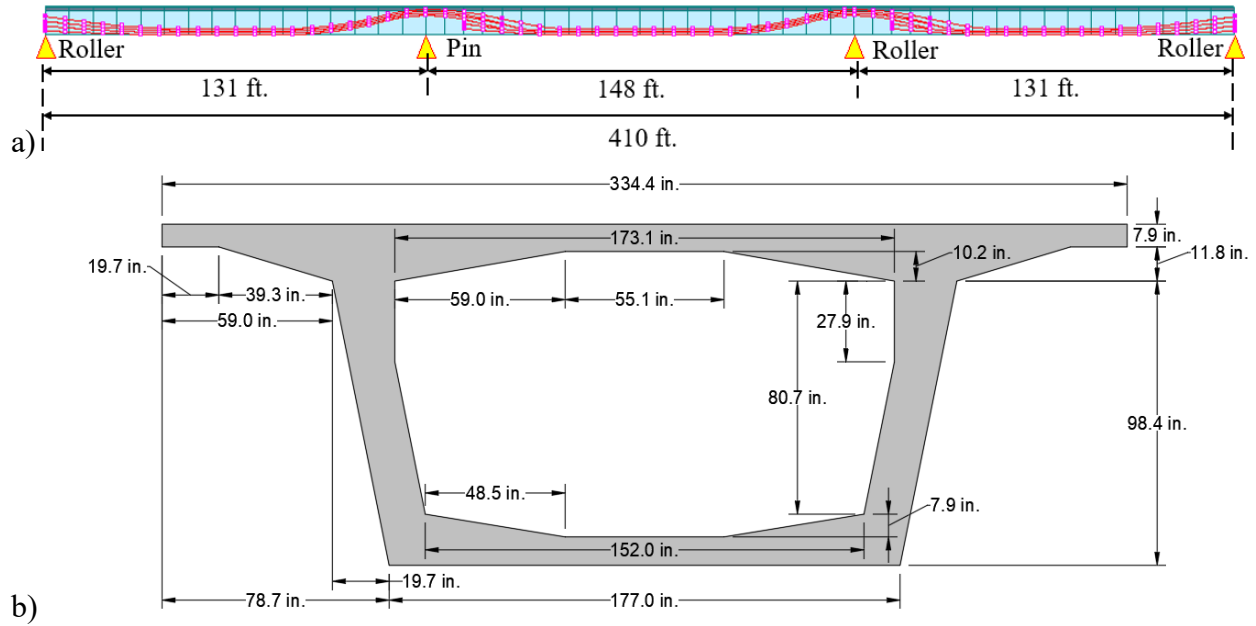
a) Elevation and b) Cross-Sectional Views of the Concrete Segmental Bridge Constructed with the Span-By-Span Method (Popok et al. 2024)
